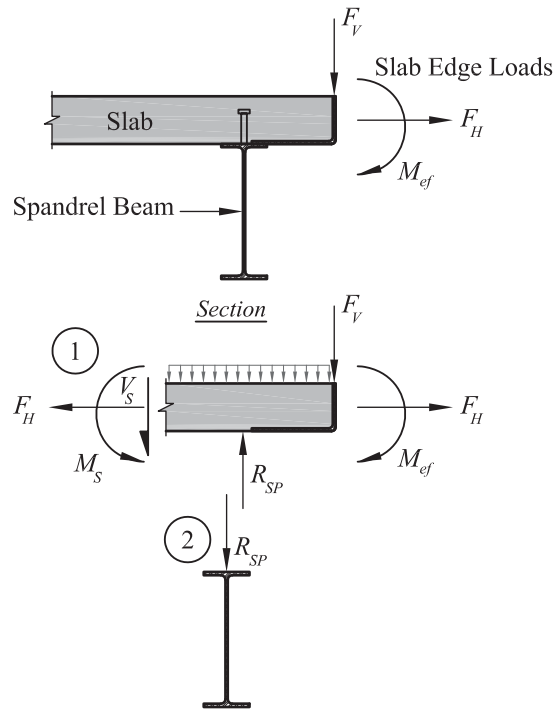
illustrates a slab designed as a cantilever overhanging the spandrel beam. The overhanging slab, as well as the back span, which is the first interior span of slab, must have shear and flexural strength sufficient for the loads. This approach has the added benefit of resolving the eccentricities of the slab edge loads without creating torsion in the spandrel beam. For these practical and economical reasons, the designer should include the slab and deck in the support system, when possible. A bent plate or light-gage metal pour stop is still needed until the concrete reaches adequate strength.
